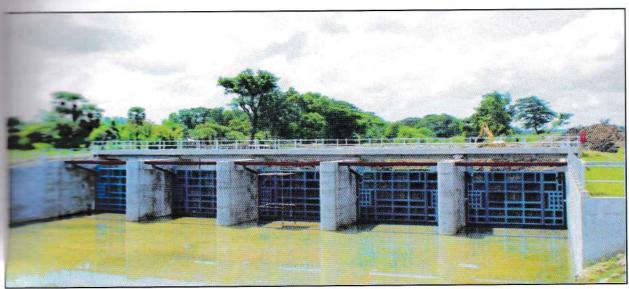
Hydraulic Elevated Dam in Anowara, Chottogram.
